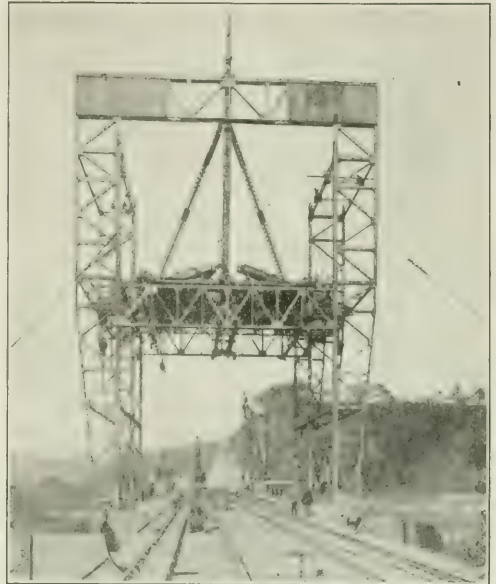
STIFF-LEG DERRICK ON TEMPORARY FLOOR RAISING GANTRY TO FULL HEIGHT
